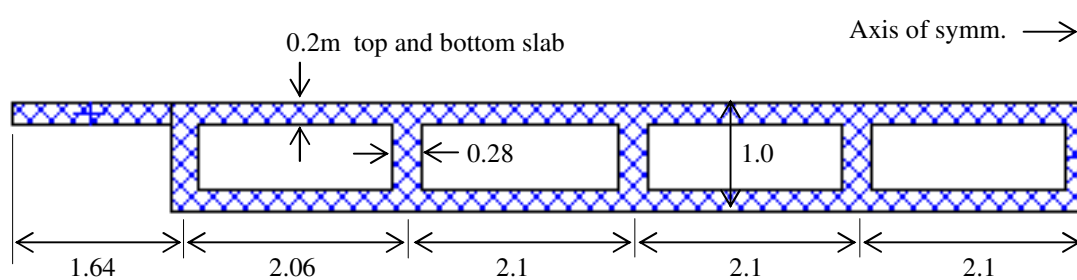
Almahata Bridge deck typical section (Dimensions in meter).
